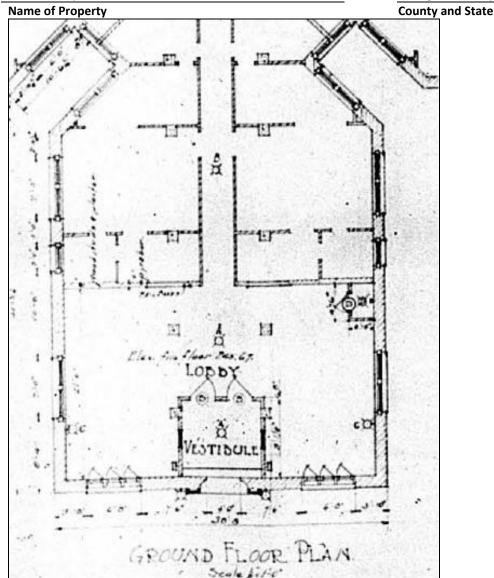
Detail of plan of ground floor of the west wing, showing lobby and vestibule.
